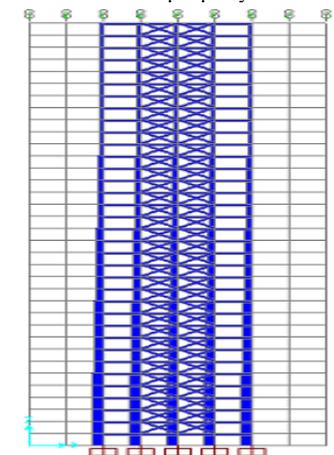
Elevation of 35 storey model showing X-brace in two central bays at outer periphery.
